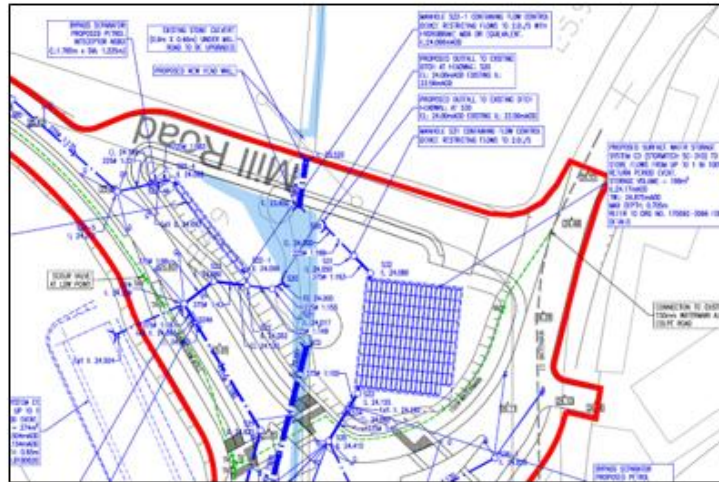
Extract of Site Services Plan (sheet 7) showing proposed upgrading of culvert under Mill Road
